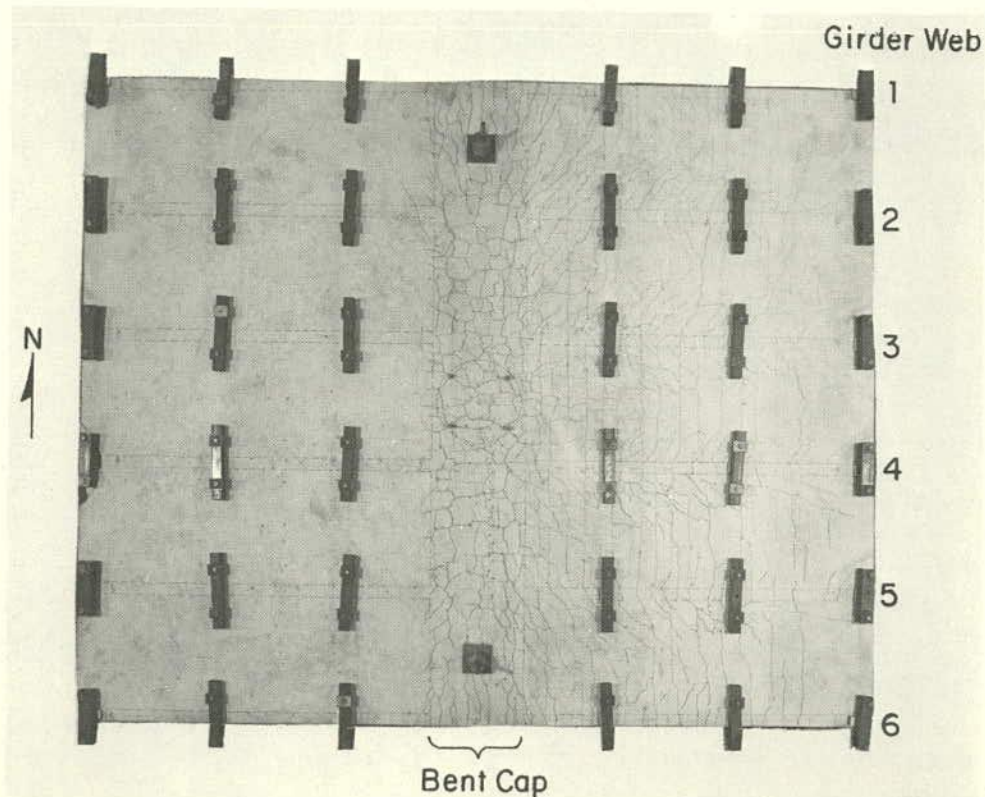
Deck Cracking of Specimen SC-3 at End of Test
